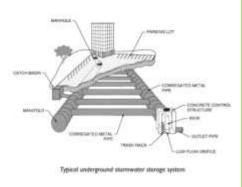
TYPICAL UNDERGROUND STORAGE CHAMBER CONFIGURATIONS
